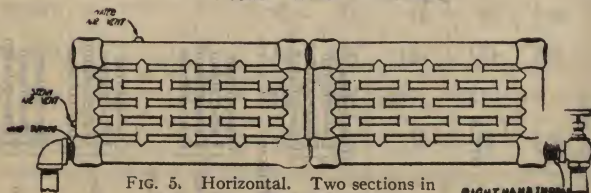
Horizontal. Two sections in two rows. Water or Steam.
